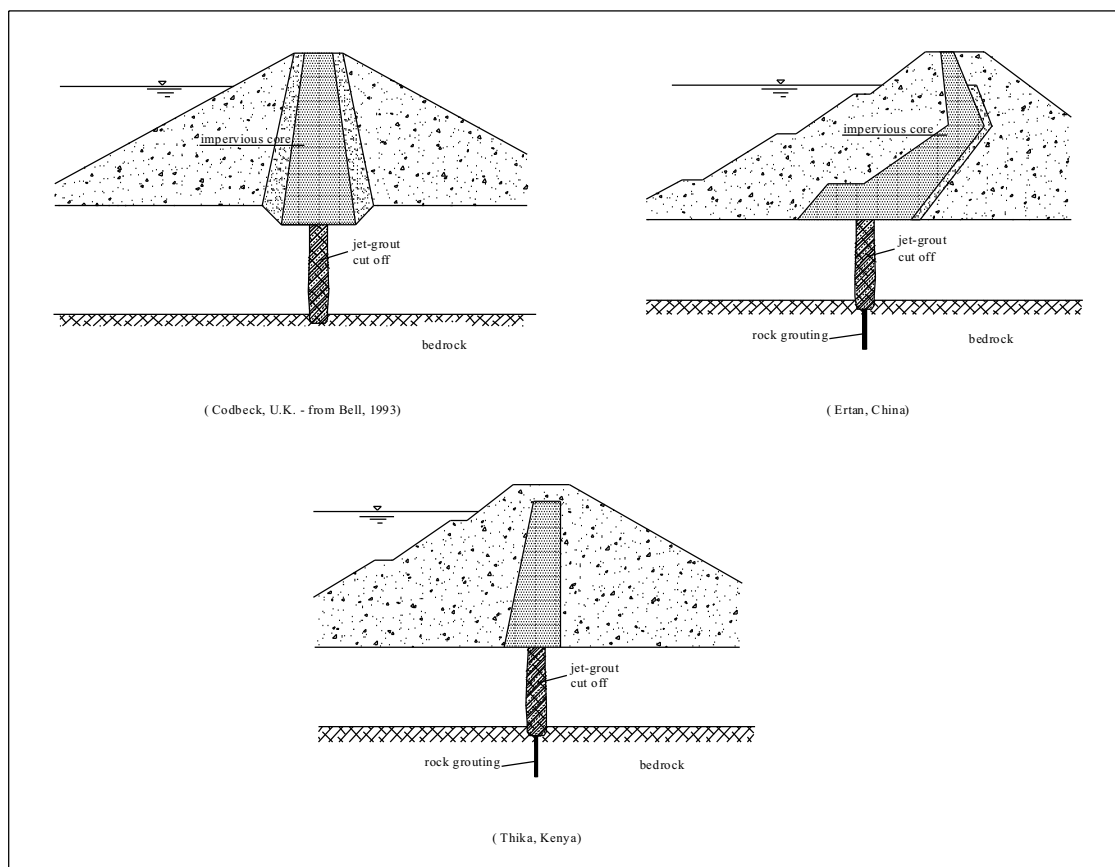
Jet grouted cutoffs installed prior to dam construction
